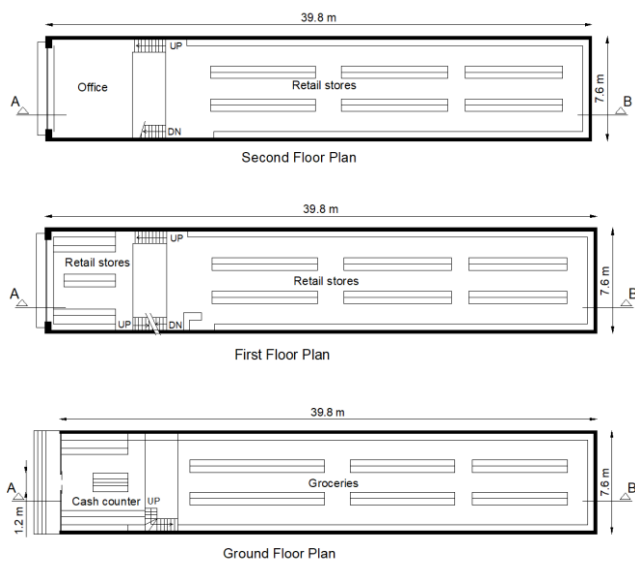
Floor plans of T-C01-01 with exit width of 1.2m
